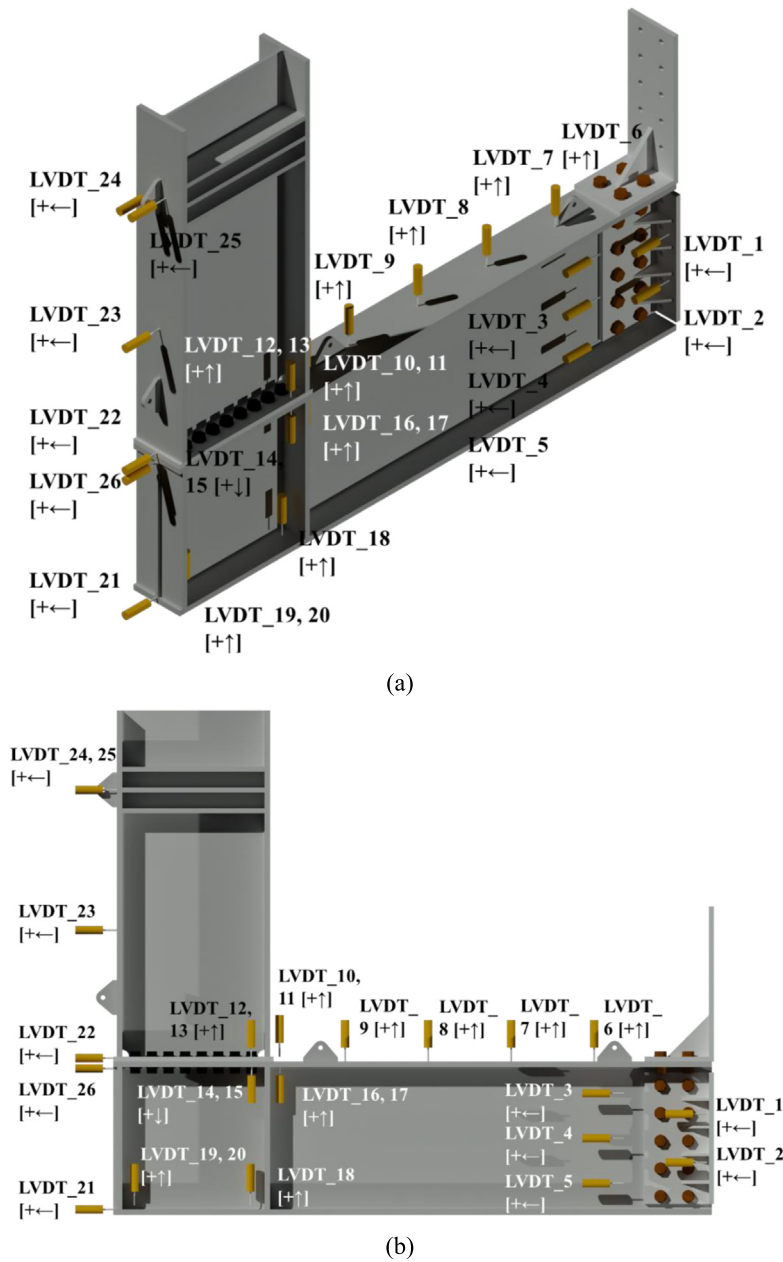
LVDTs on C2 test specimen. (a) 3D view. (b) Elevation view.
